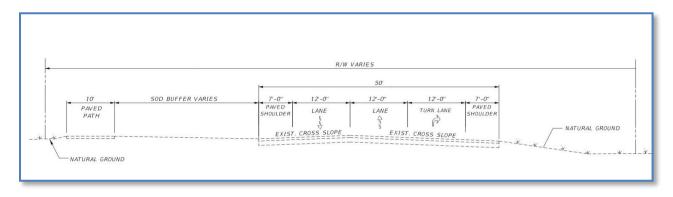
Typical Section: Roadway Farther West Figure 3-6
